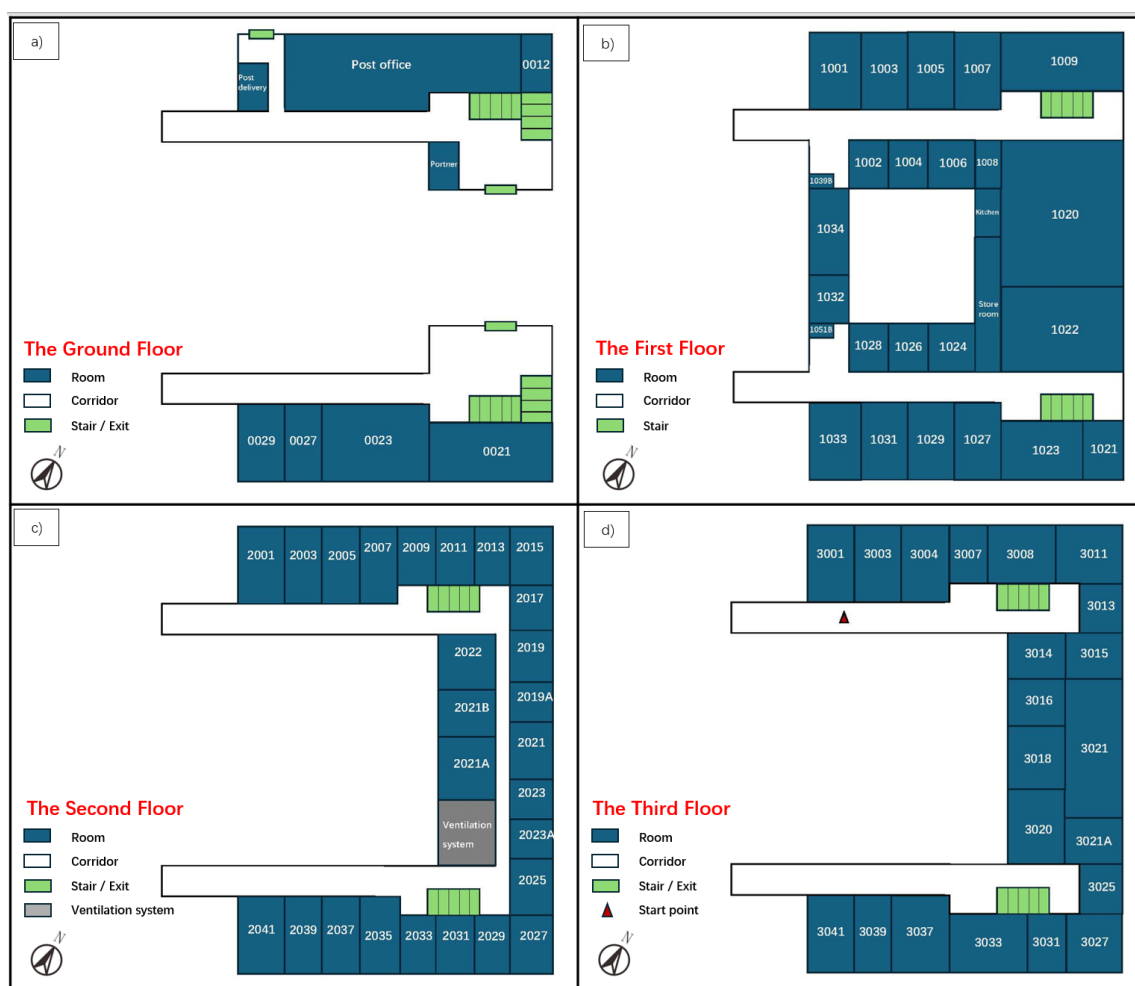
Floor plans of the experimental building used in the evacuation task, covering (a) the ground floor, (b) the first floor, (c) the second floor, and (d) the third floor.
